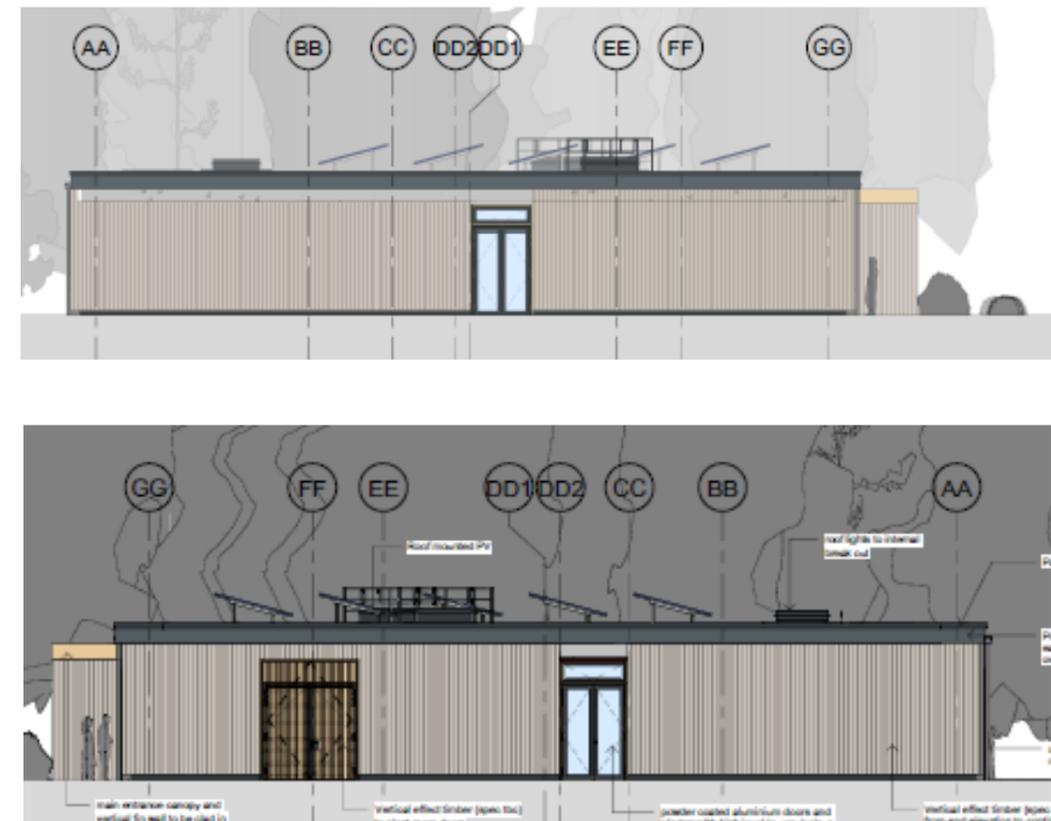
Architectural Elevations. Courtesy: Pozzoni Architects
